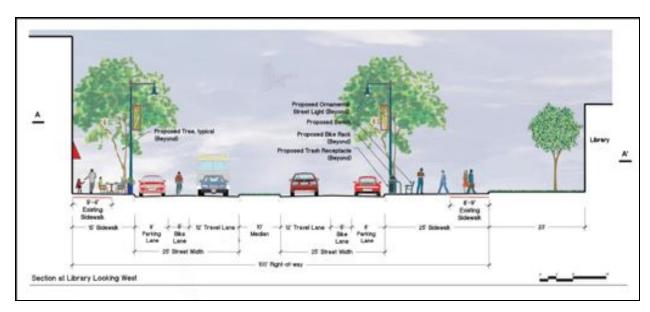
Cross section of the city of Somerville's streetscape plan at 130 Broadway.
